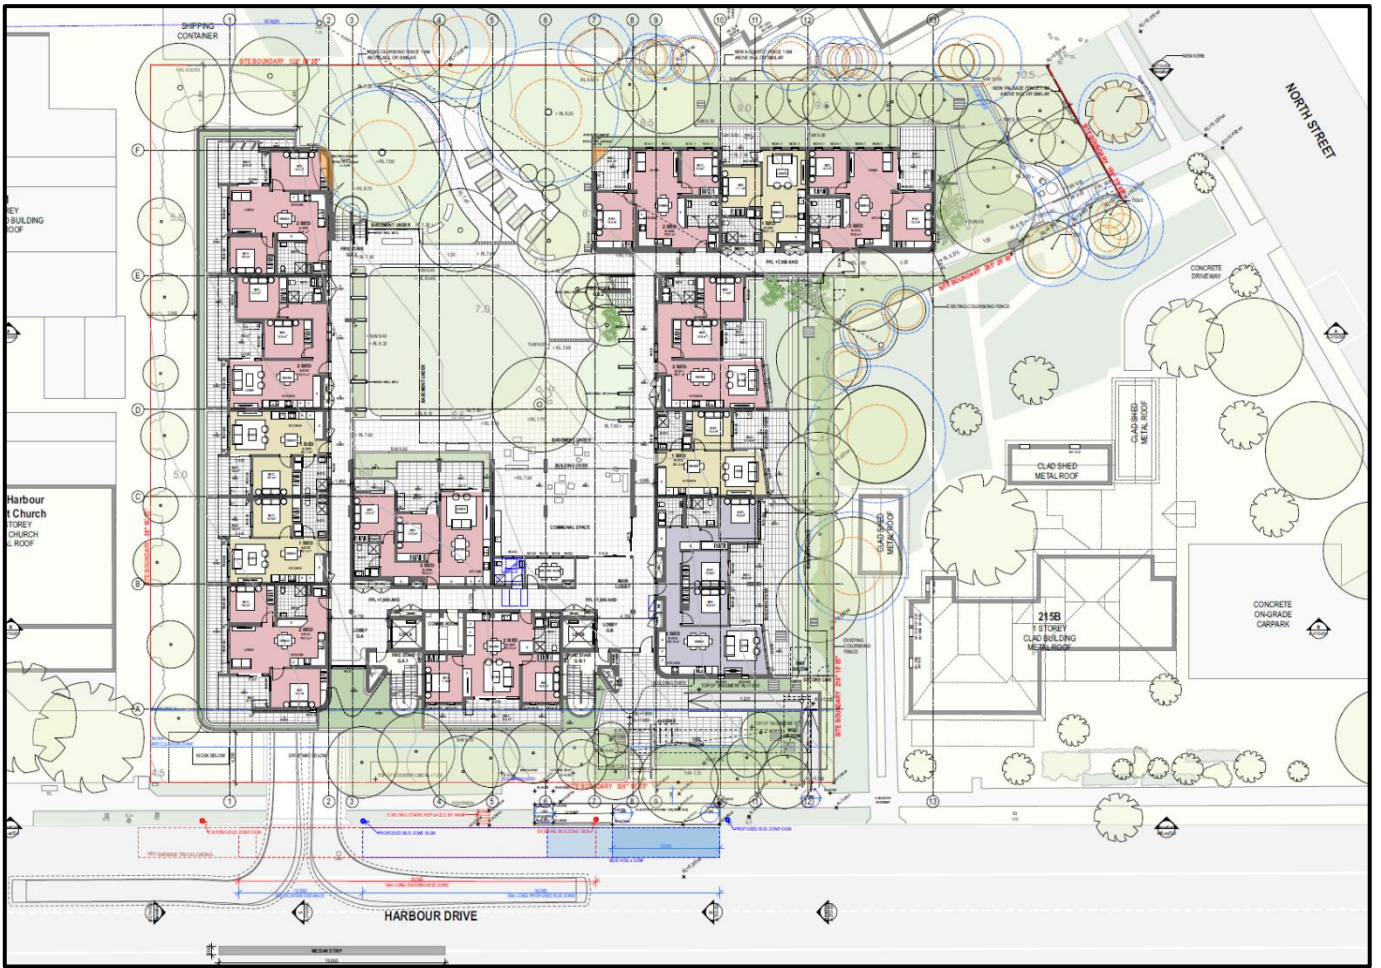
| Proposed ground floor plan (source: Applicant RtS)
